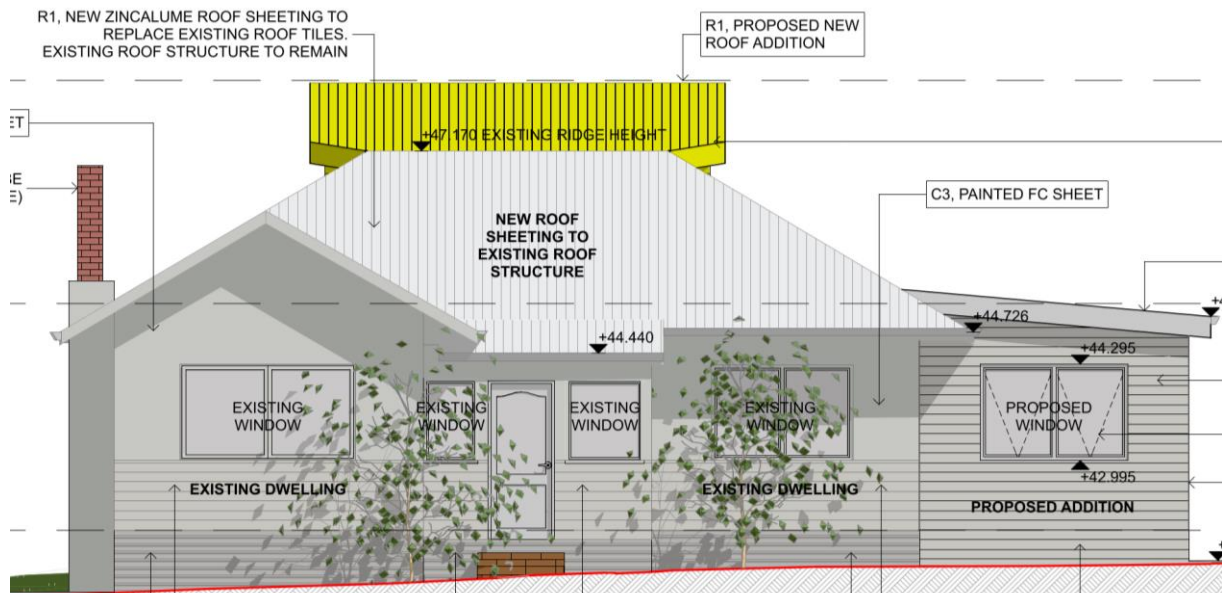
Street elevation (south) with proposed upper floor addition highlighted in yellow.
